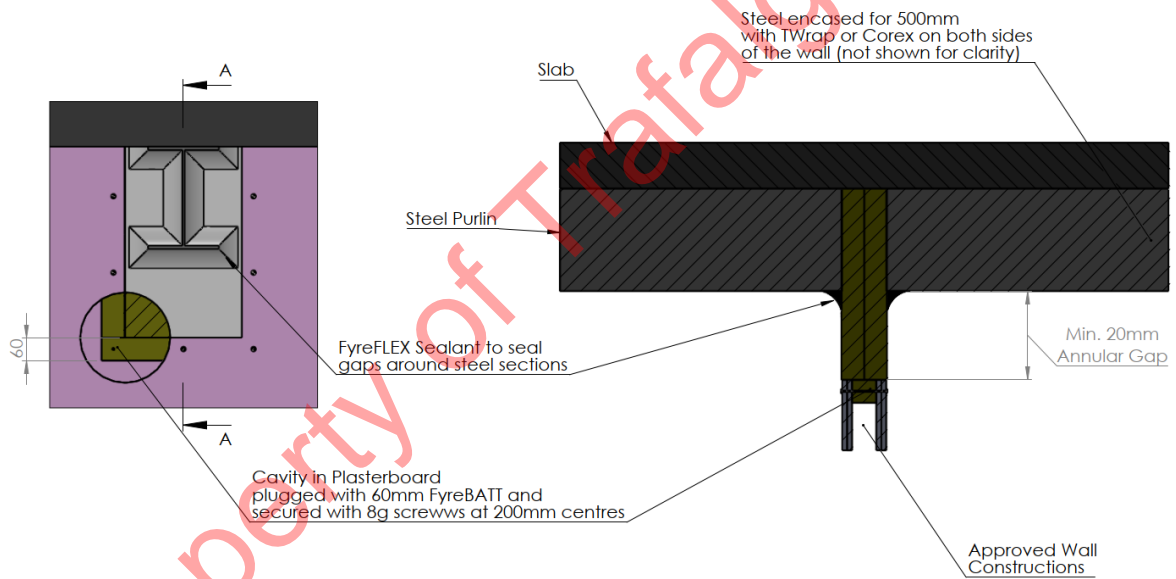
Proposed steel beam/purlin penetration system – detail 11
